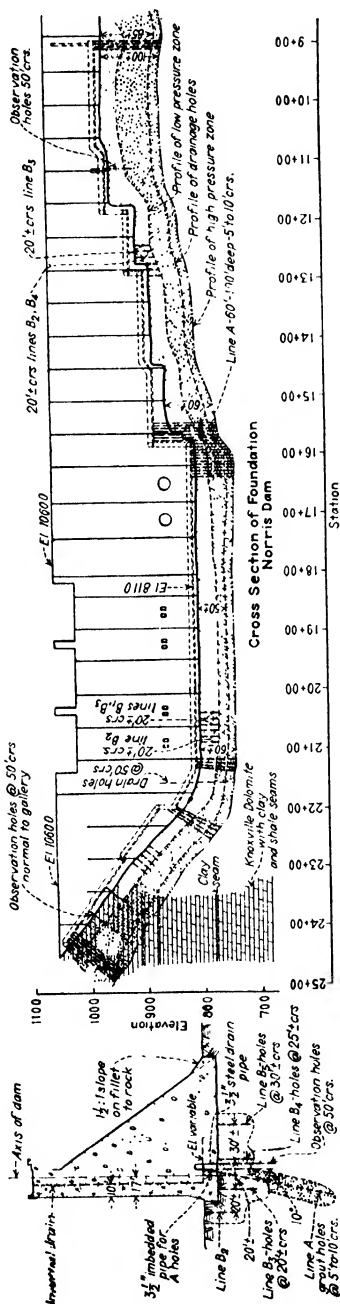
Diagram of grout curtain under Norris Dam to cut off seepage through rock fissures.
